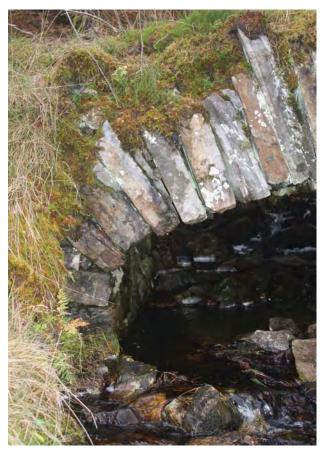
Bridge 008, detail of the north side showing the slipped voussoir stones to the east side
